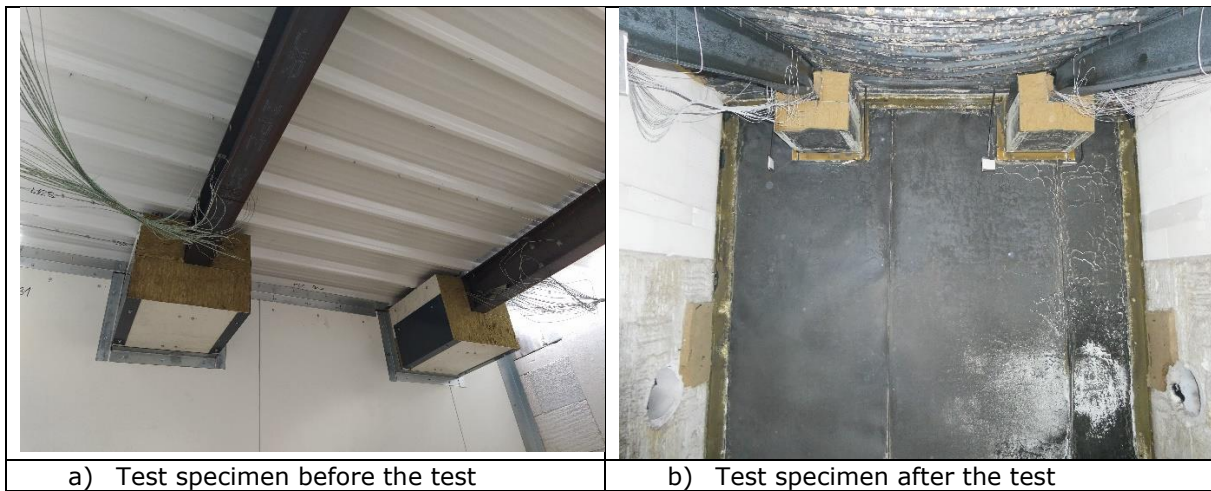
Fire test on a fire wall crossed by steel purlins – Fishwall project
